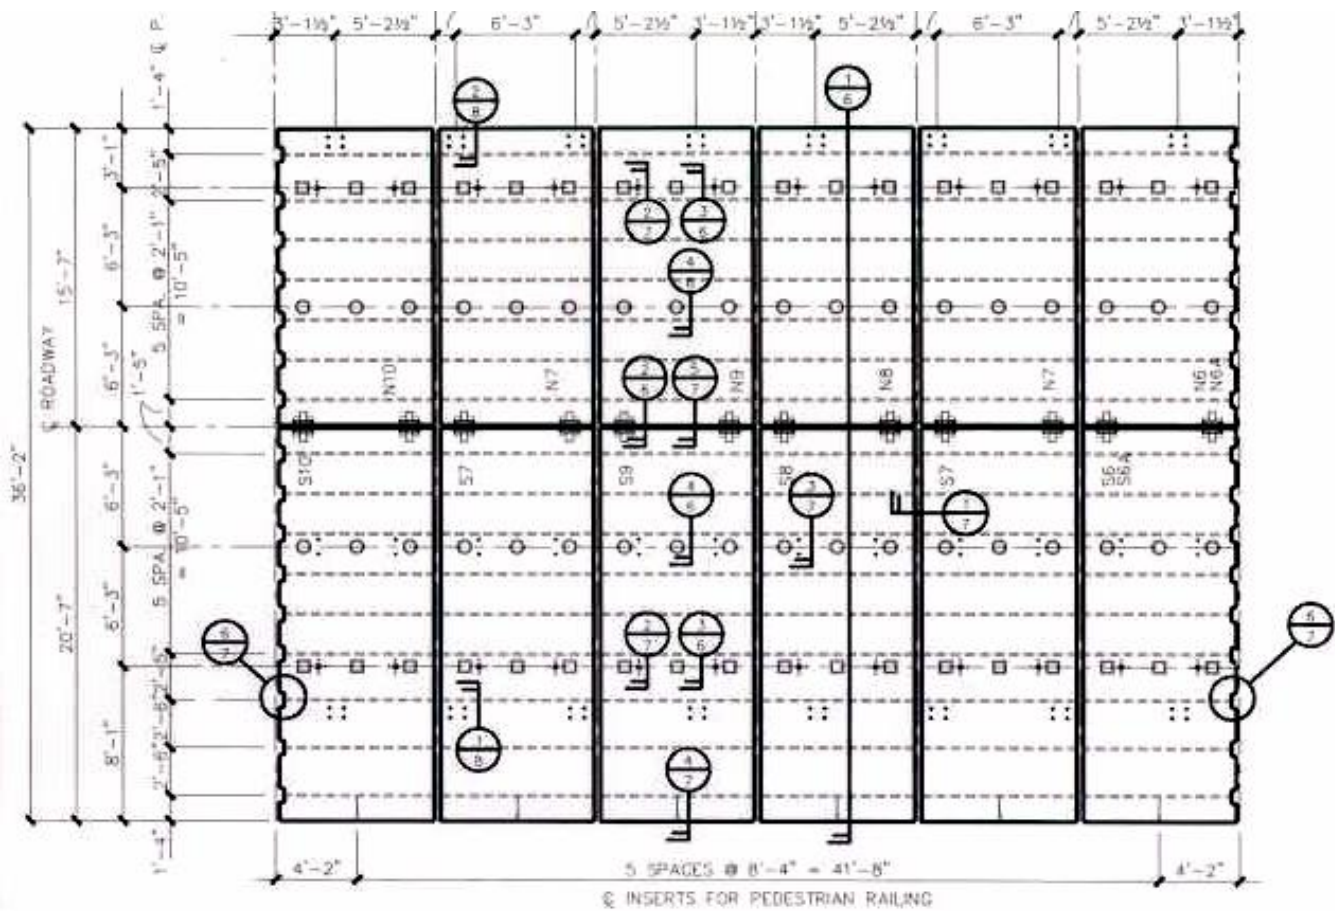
Typical 50-ft bay with longitudinal post-tensioning
